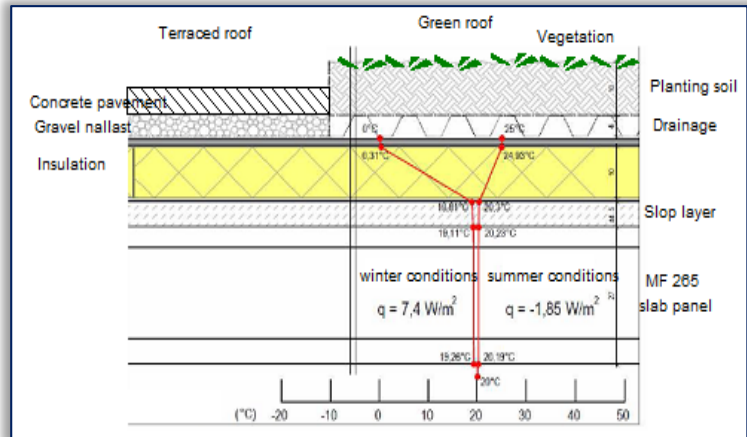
Layers of the green roof and terraced roof with the green roof temperature distribution in stationary state
